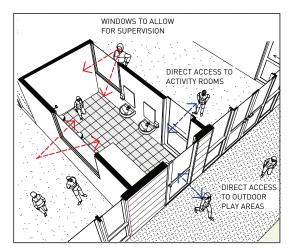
Bathroom facilities to have direct access to outdoor areas and activity rooms. Supervision requirements need to be considered in the design to prevent blind spots.
